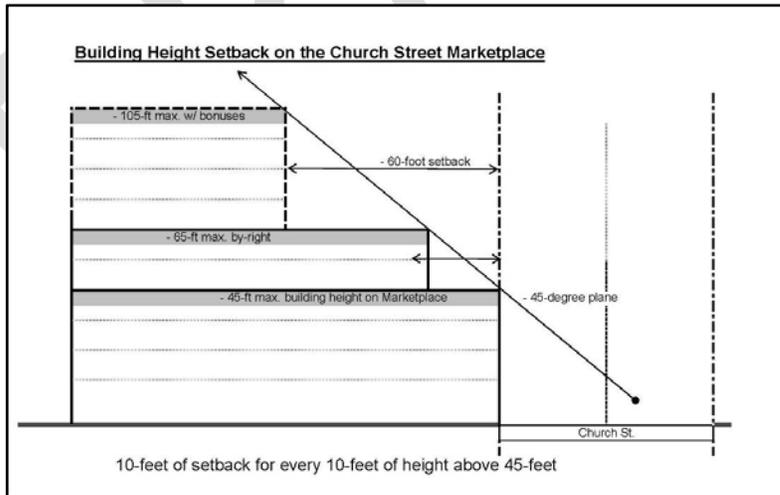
Measuring Height Limits for Church Street Buildings
